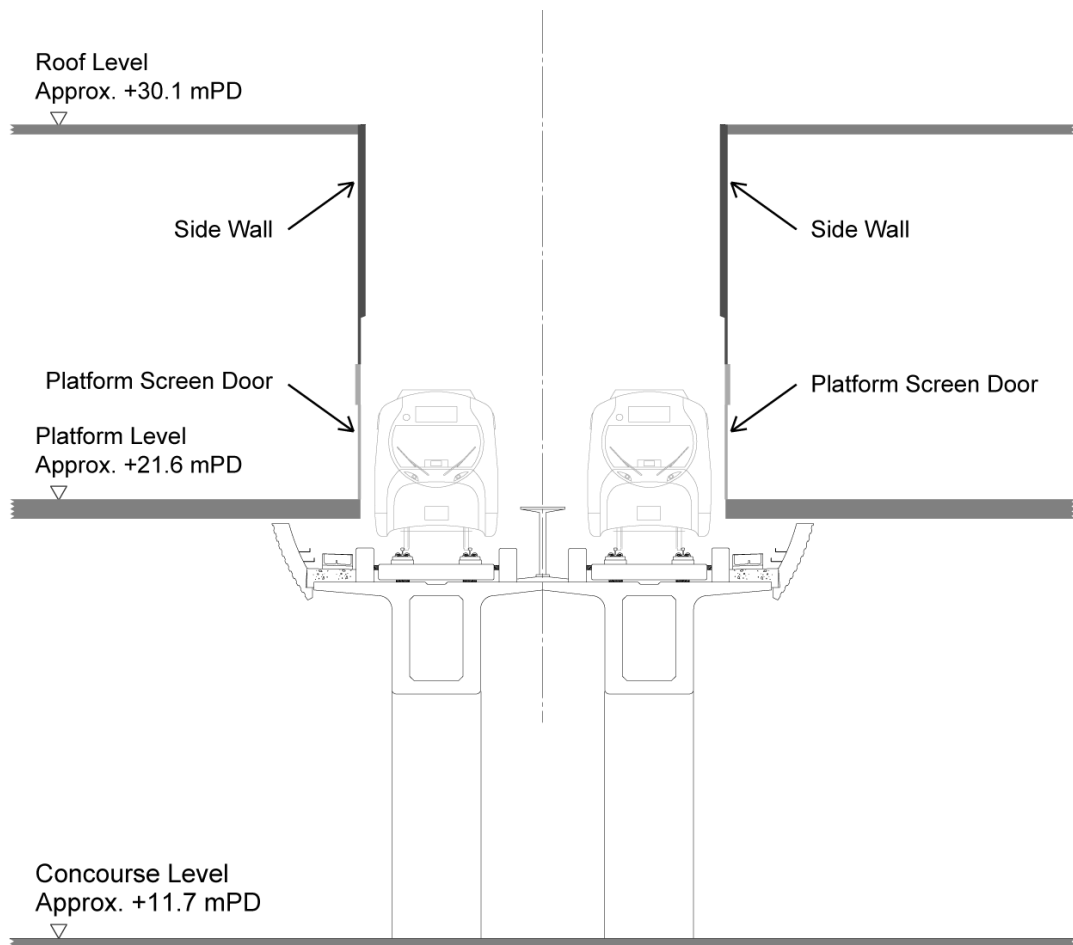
Sketch of Cross Section at Station Back-of-House Structure
